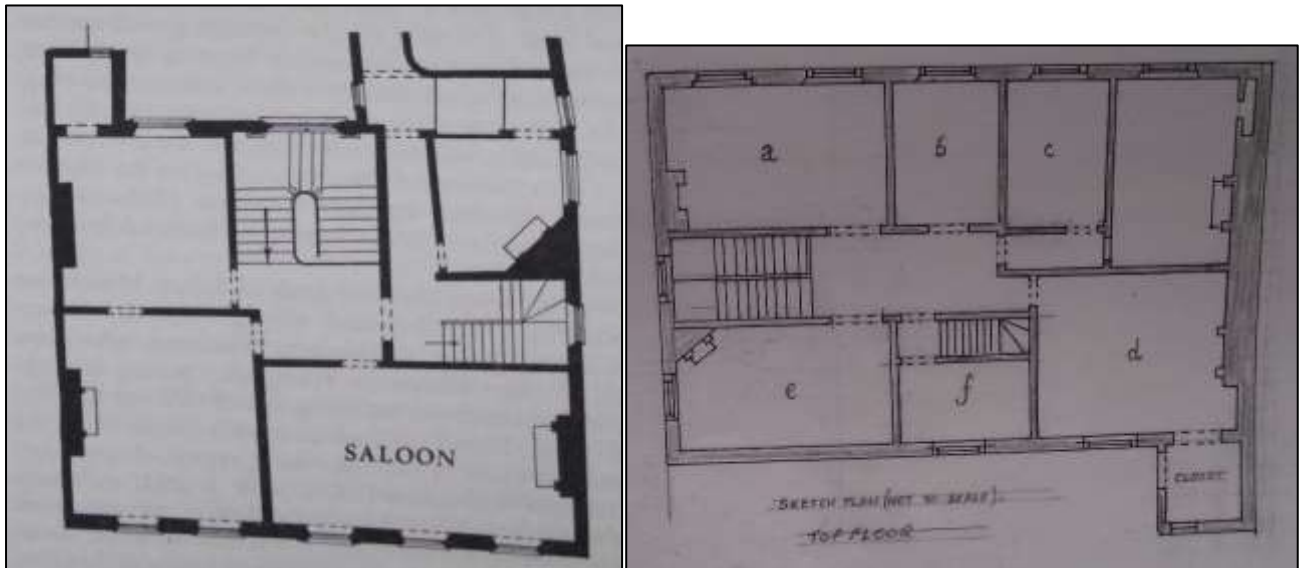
First (left) and second (right) floor plans for Bathurst House (© RCHME, figure 57)
